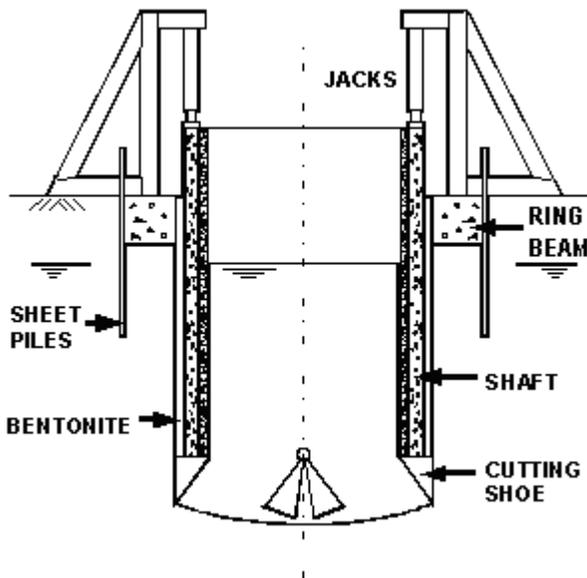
Seal chamber bolted segmental caisson installation for sea outfall, Site C (after Heavey, et al., 2000)
